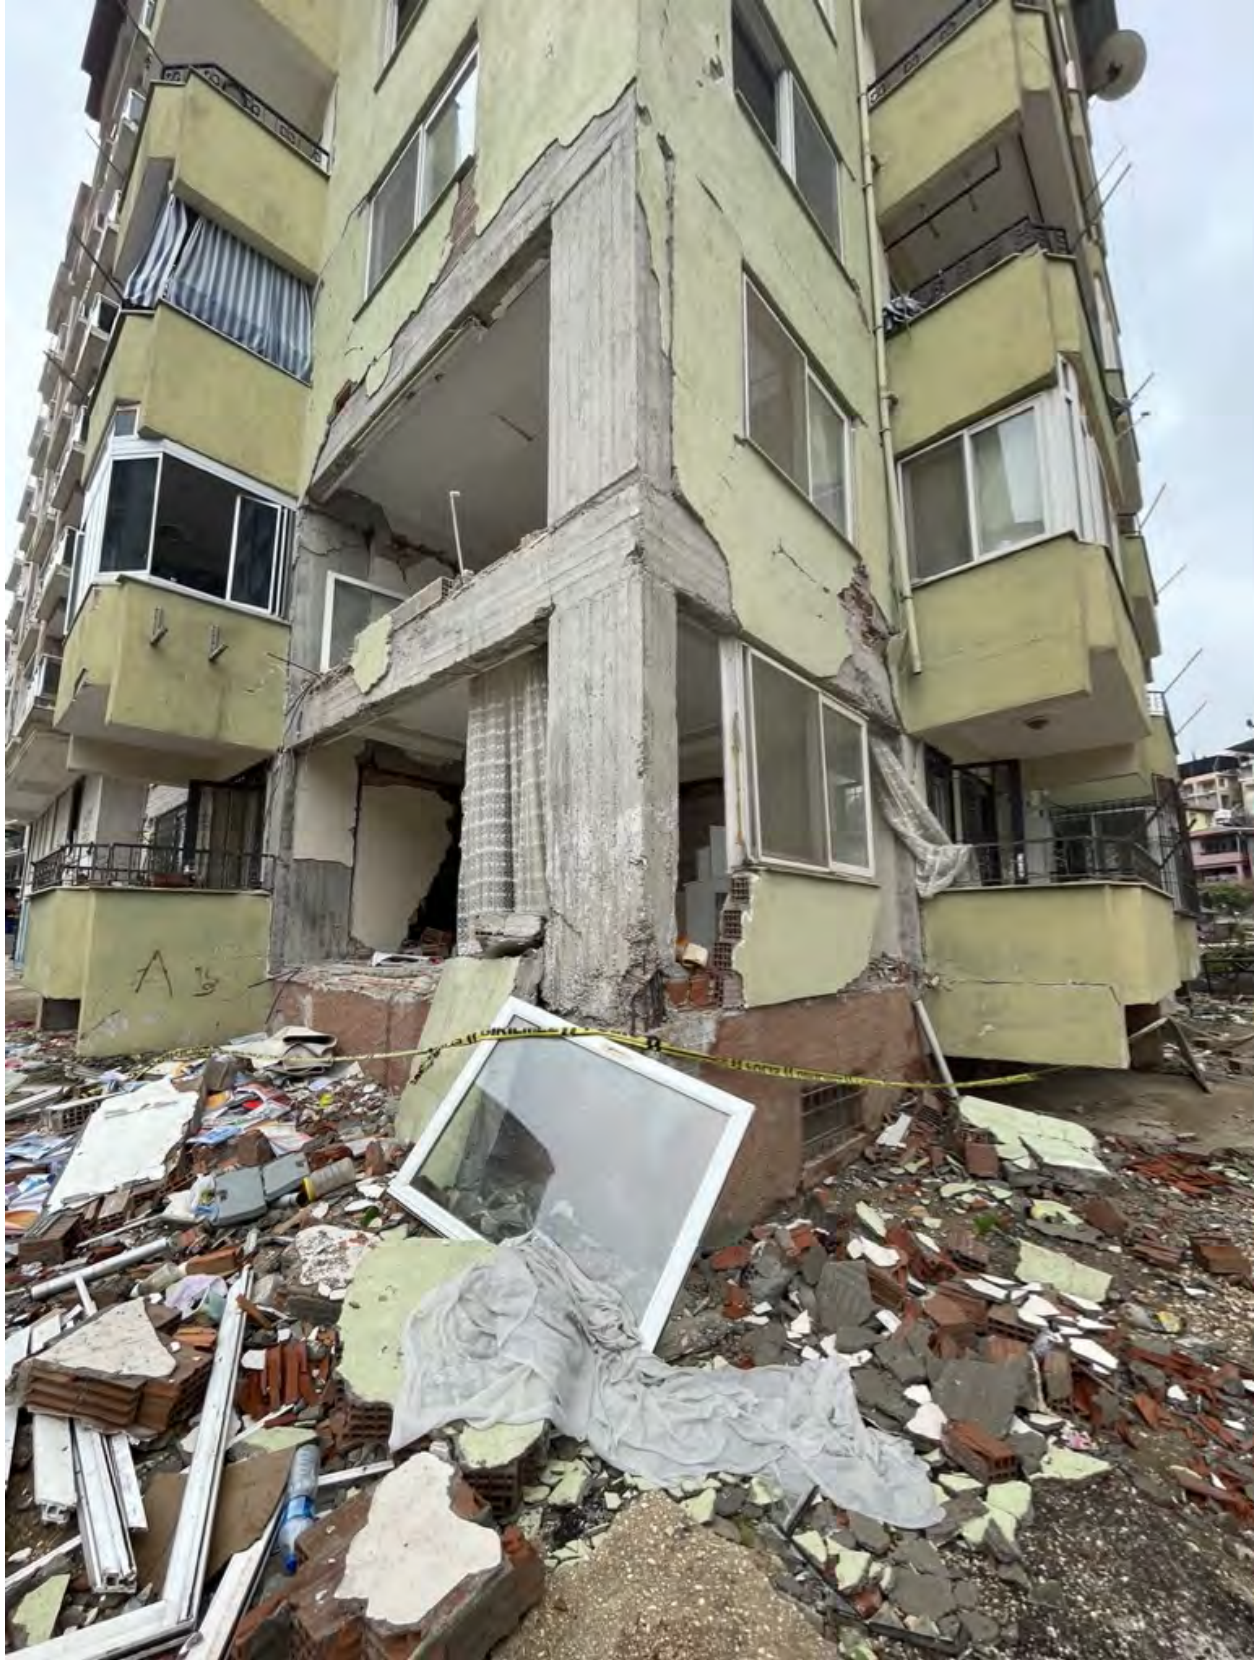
Cracking of infill wall facade with delamination of insulation and waterproof membrane in residential building near İskenderun.
